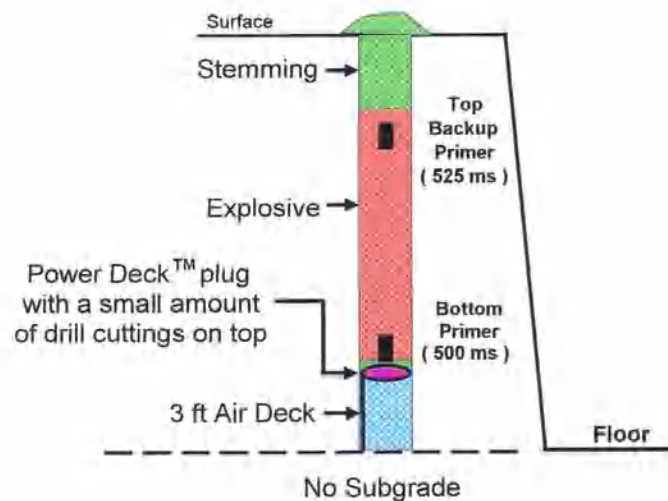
Continuous explosive load with a 3-foot bottom hole air deck and no subgrade.
